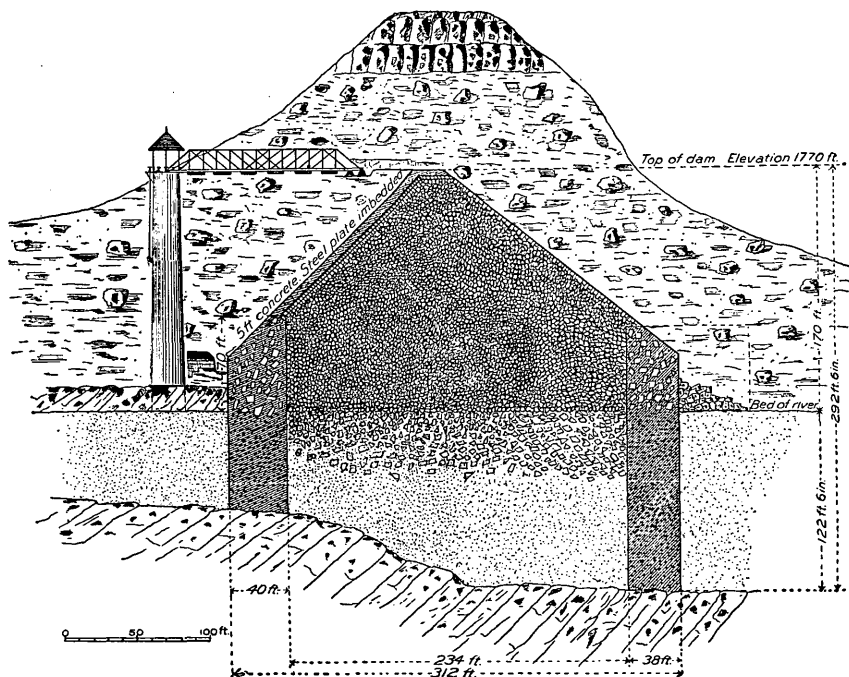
Maximum cross section of proposed dam at Buttes, Arizona.
